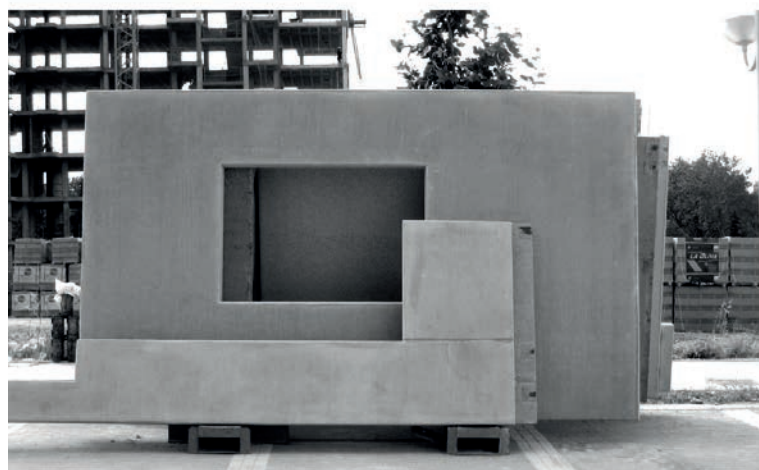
First: Mendes da Rocha, Bellosillo and MMBB, Vallecas Building, Madrid, Spain, 2004, prefabricated wall panels. MMBB Archive.
